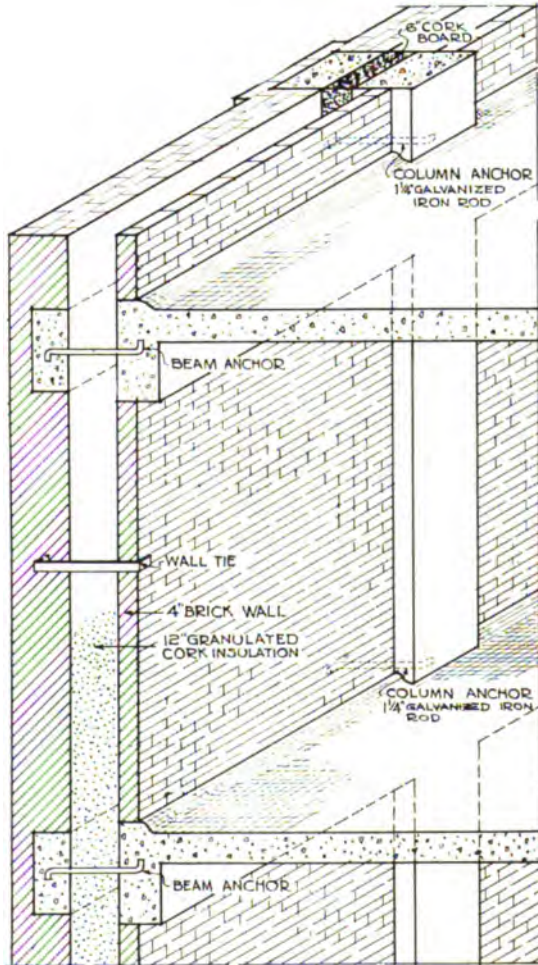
DETAIL OF DOUBLE WALL—GRANULATED CORK INSULATION.
